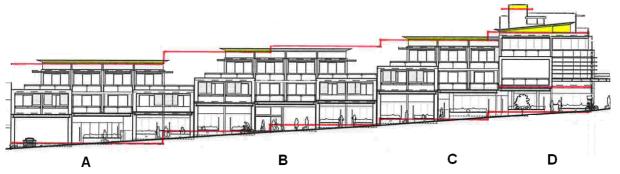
Building height non-compliance as viewed from Lawrence Street. Source: Adapted by author from Plan No. DA10 dated 19 October 2012 as prepared by PBD Architects.
